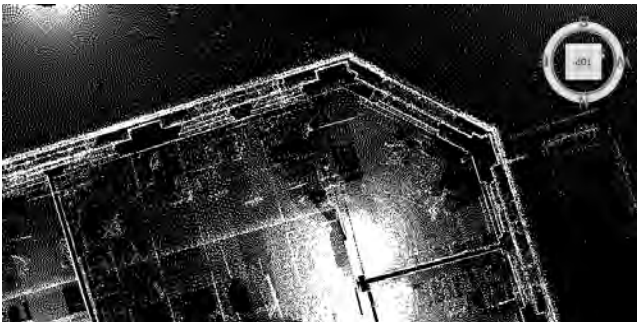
Plan of building envelope in Autodesk Navisworks after combing interior and exterior scans.
